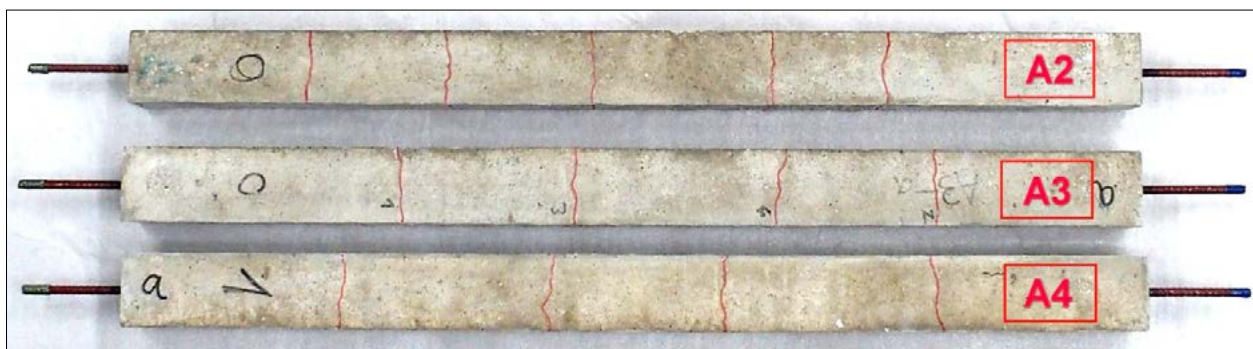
Test specimens after the accelerated corrosion process (crack pattern marked with red colour)
